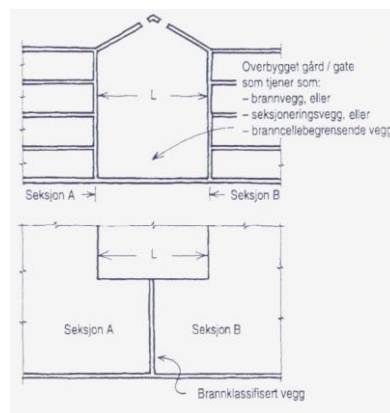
Atrium with smoke ventilation serving as fire sectioning wall [52, p. 77]
